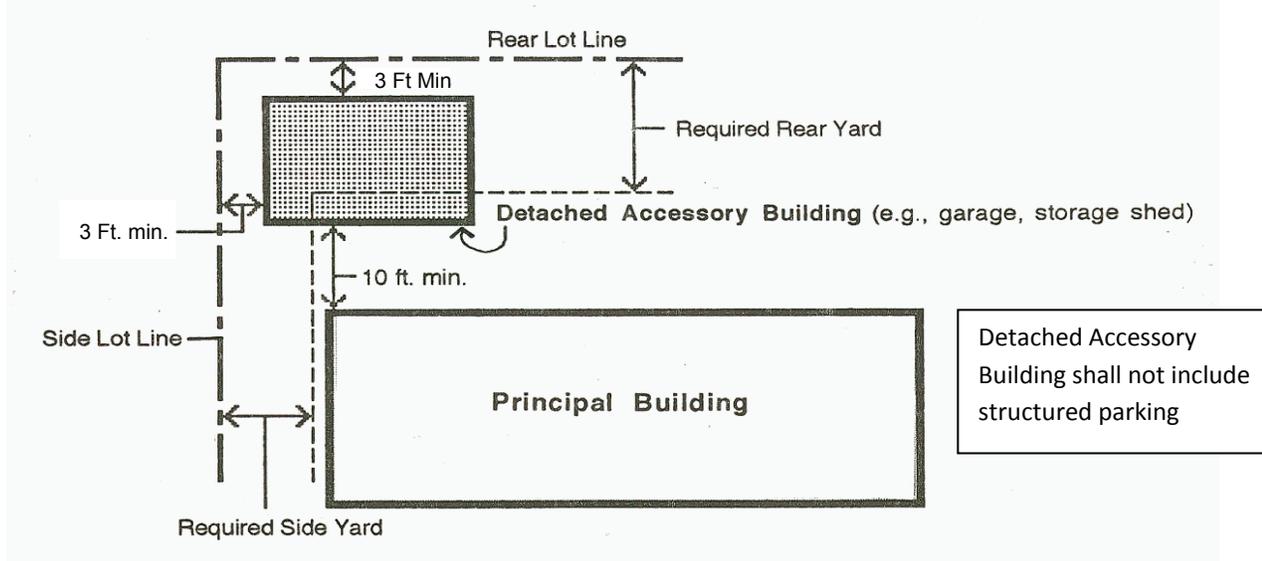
Location(s) of Accessory Buildings on Lot.
